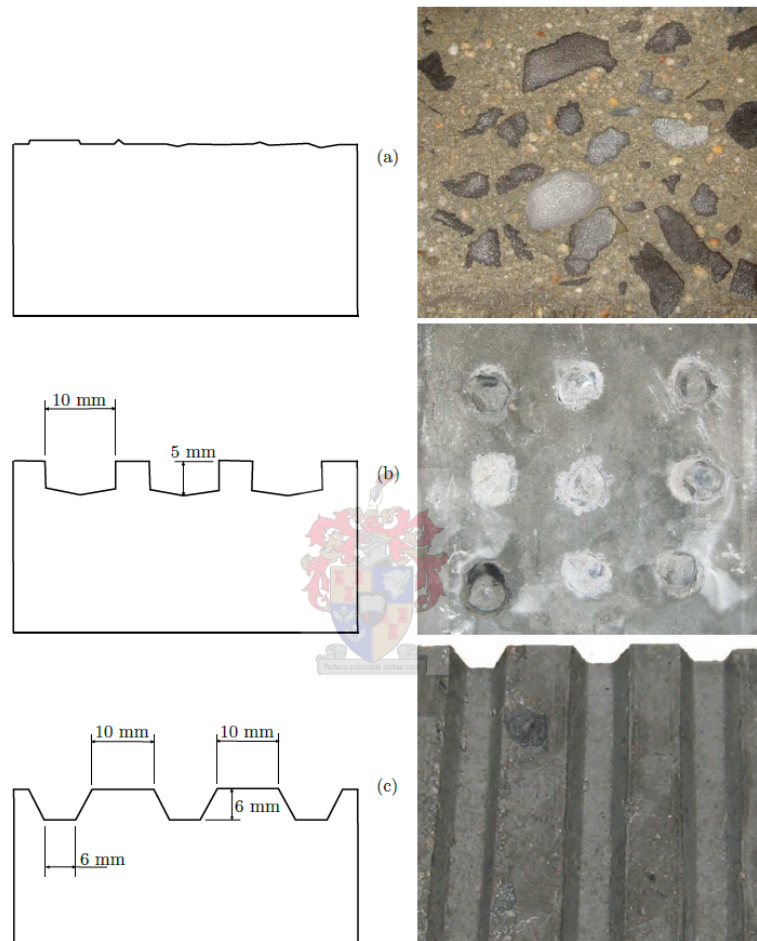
Illustrations of (a) sandblast, (b) drill holes and (c) groove roughened surfaces [28].
